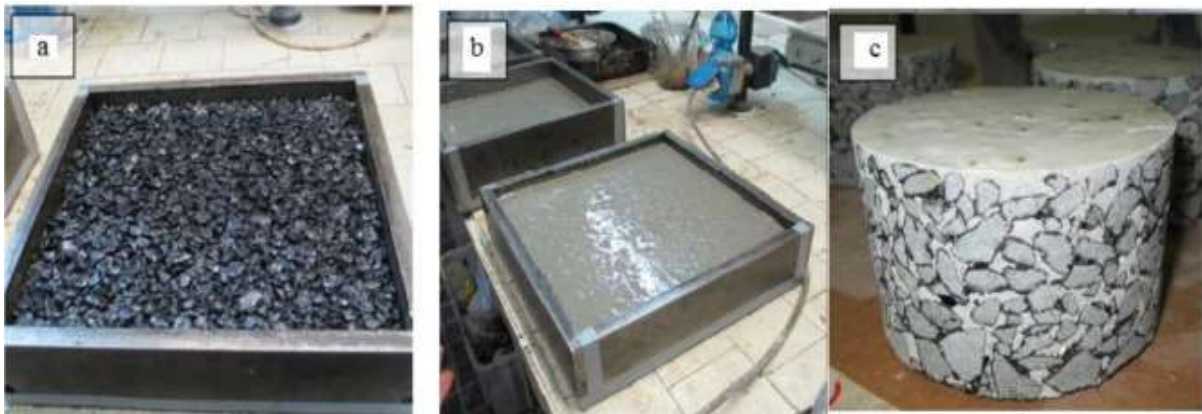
Steps of semi-flexible Mix construction (a) Open-graded asphalt mixture (b) Introducing grout into the asphalt mixture (c) Specimen after curing process (Corradini et al. 2017)
